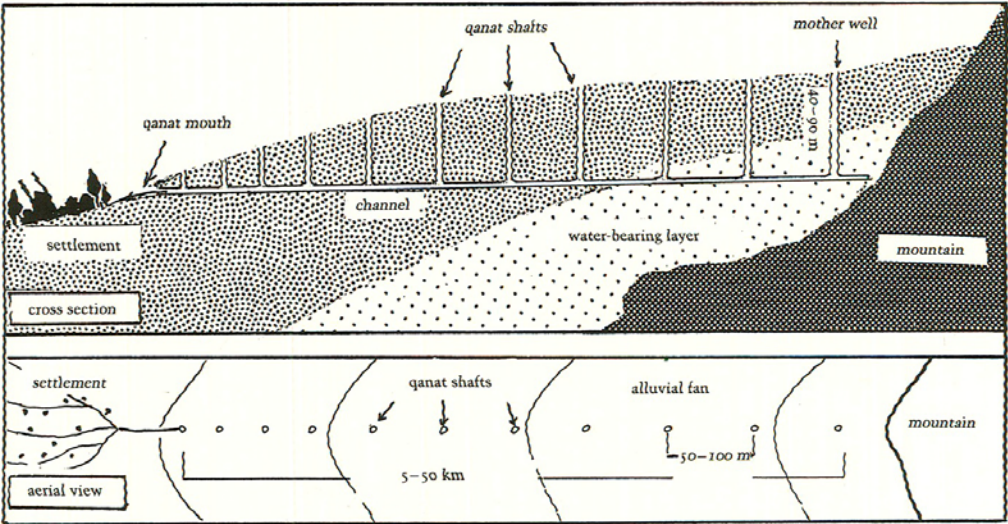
Diagram of a typical *qanat* construction seen in plan and section (source: Kheirabadi 1991)
